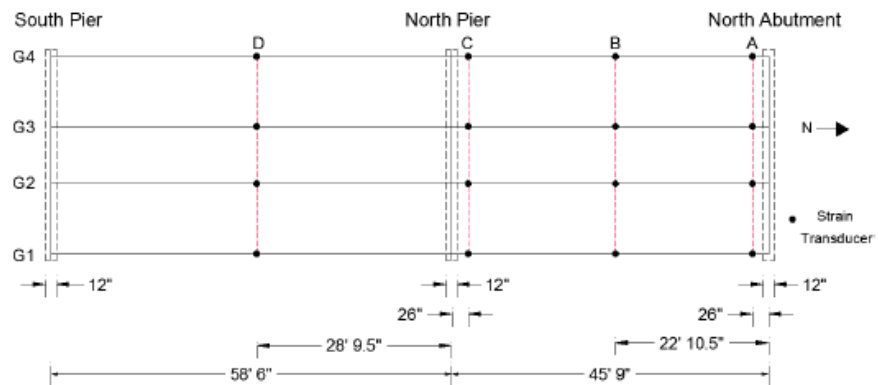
Ida County Bridge Plan View of Strain Transducer Locations
